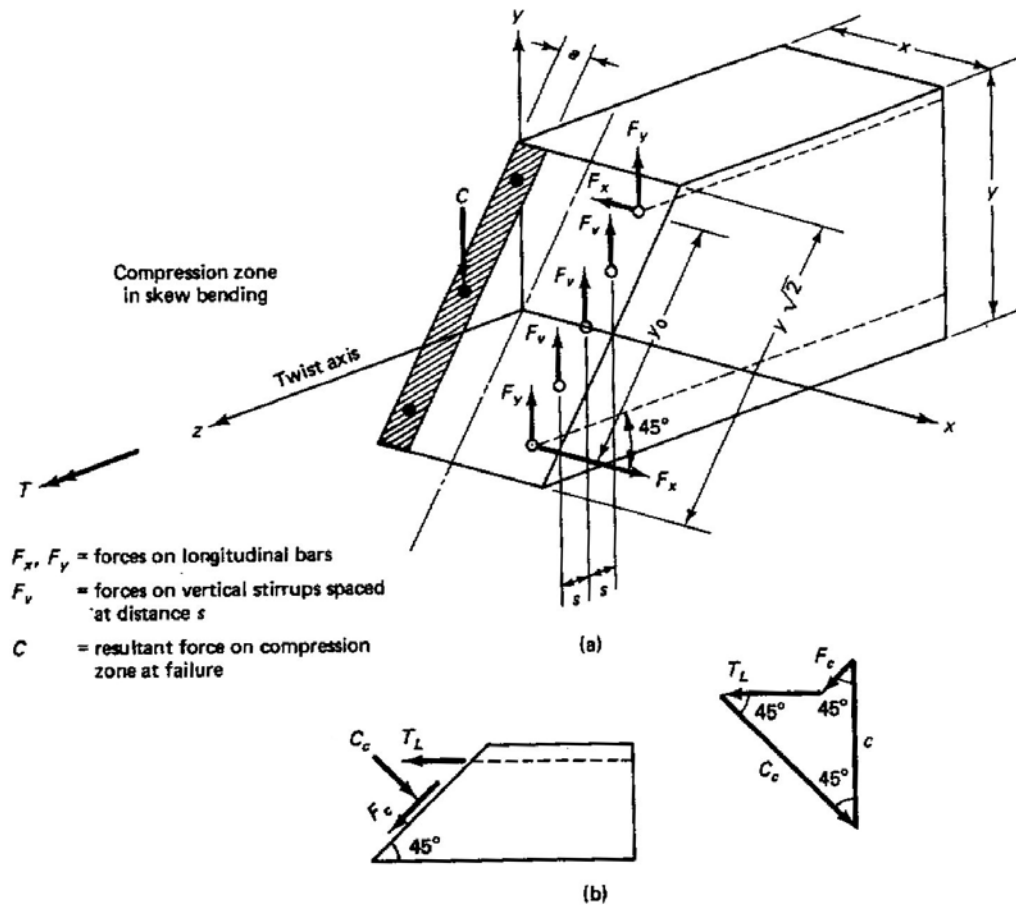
Forces on the skew-bent planes. (a) All forces acting on skew plane at failure. (b) Vector forces on compression zone.
